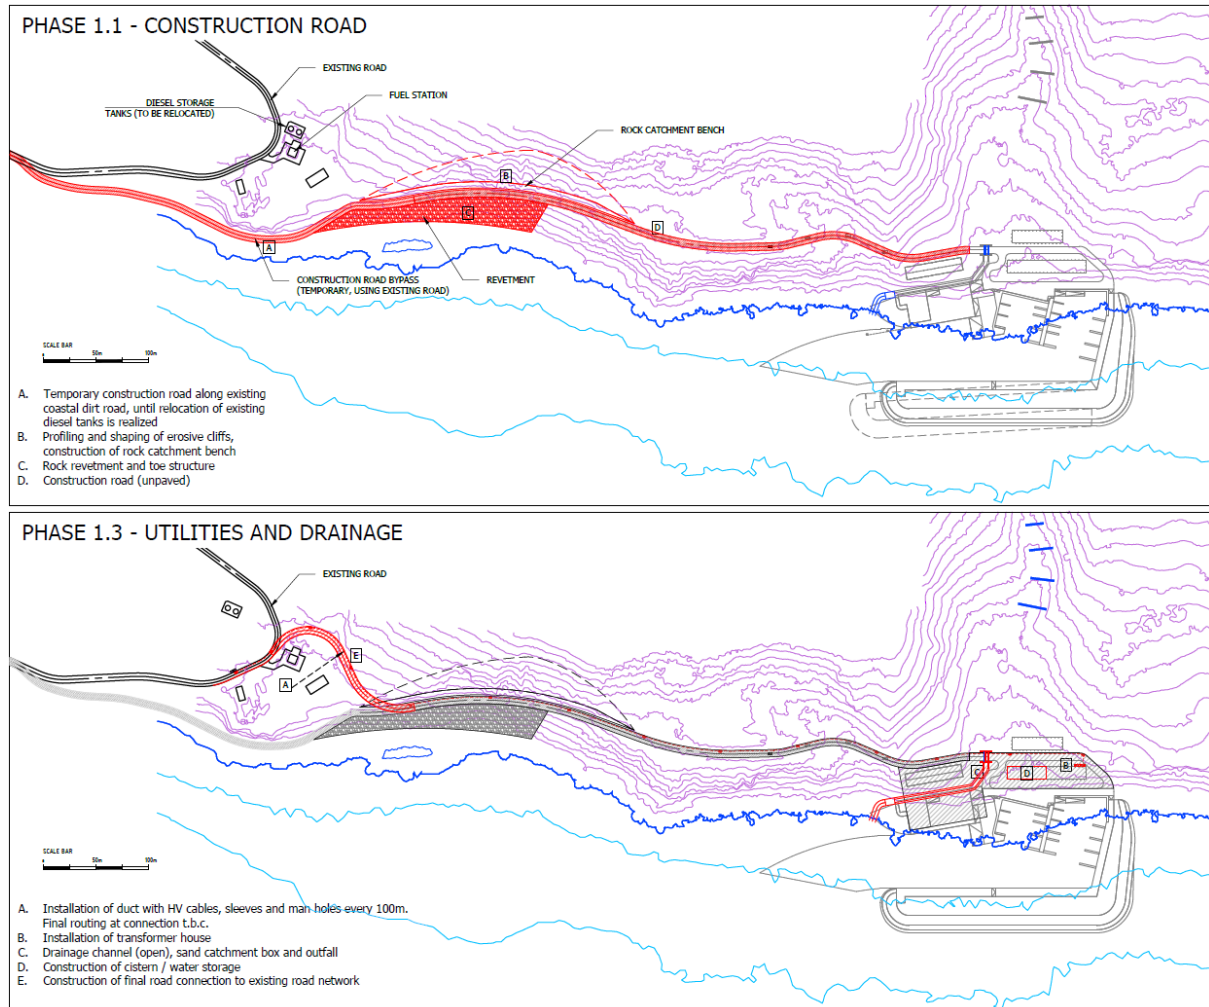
Two phases of road construction. Top: connection to harbor area by means of temporary road along the coast (currently unpaved road). Bottom: final road connection after relocation of fuel tanks.
